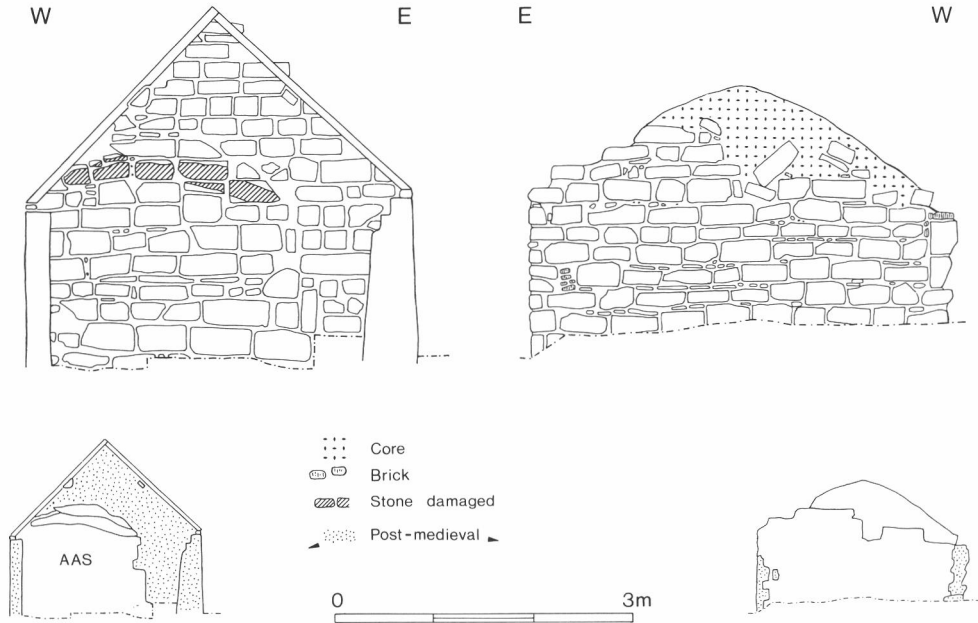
Dale Abbey. Area I: elevation of AAS, the standing fragment of the north wall of the South Range. Damaged stonework on the south elevation indicates the line of the vault, supporting the first-floor Frater.
